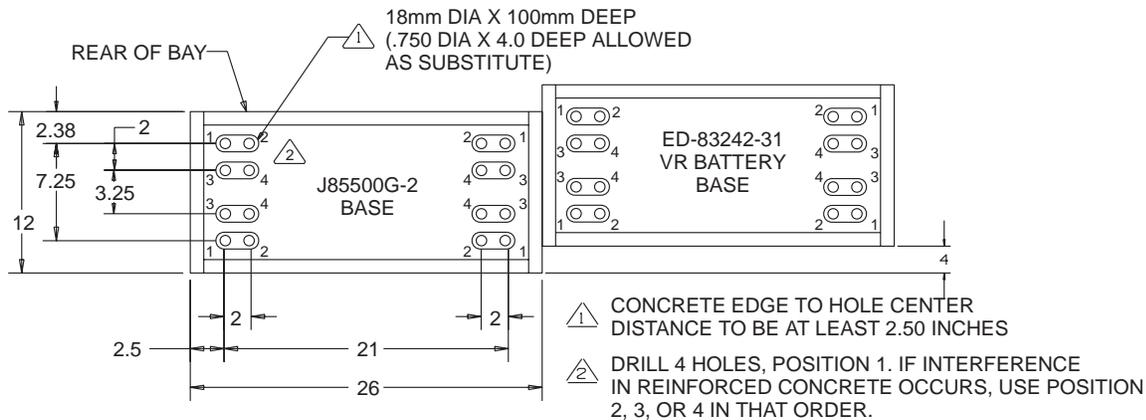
Floor mounting template (all dimensions are given in inches)
